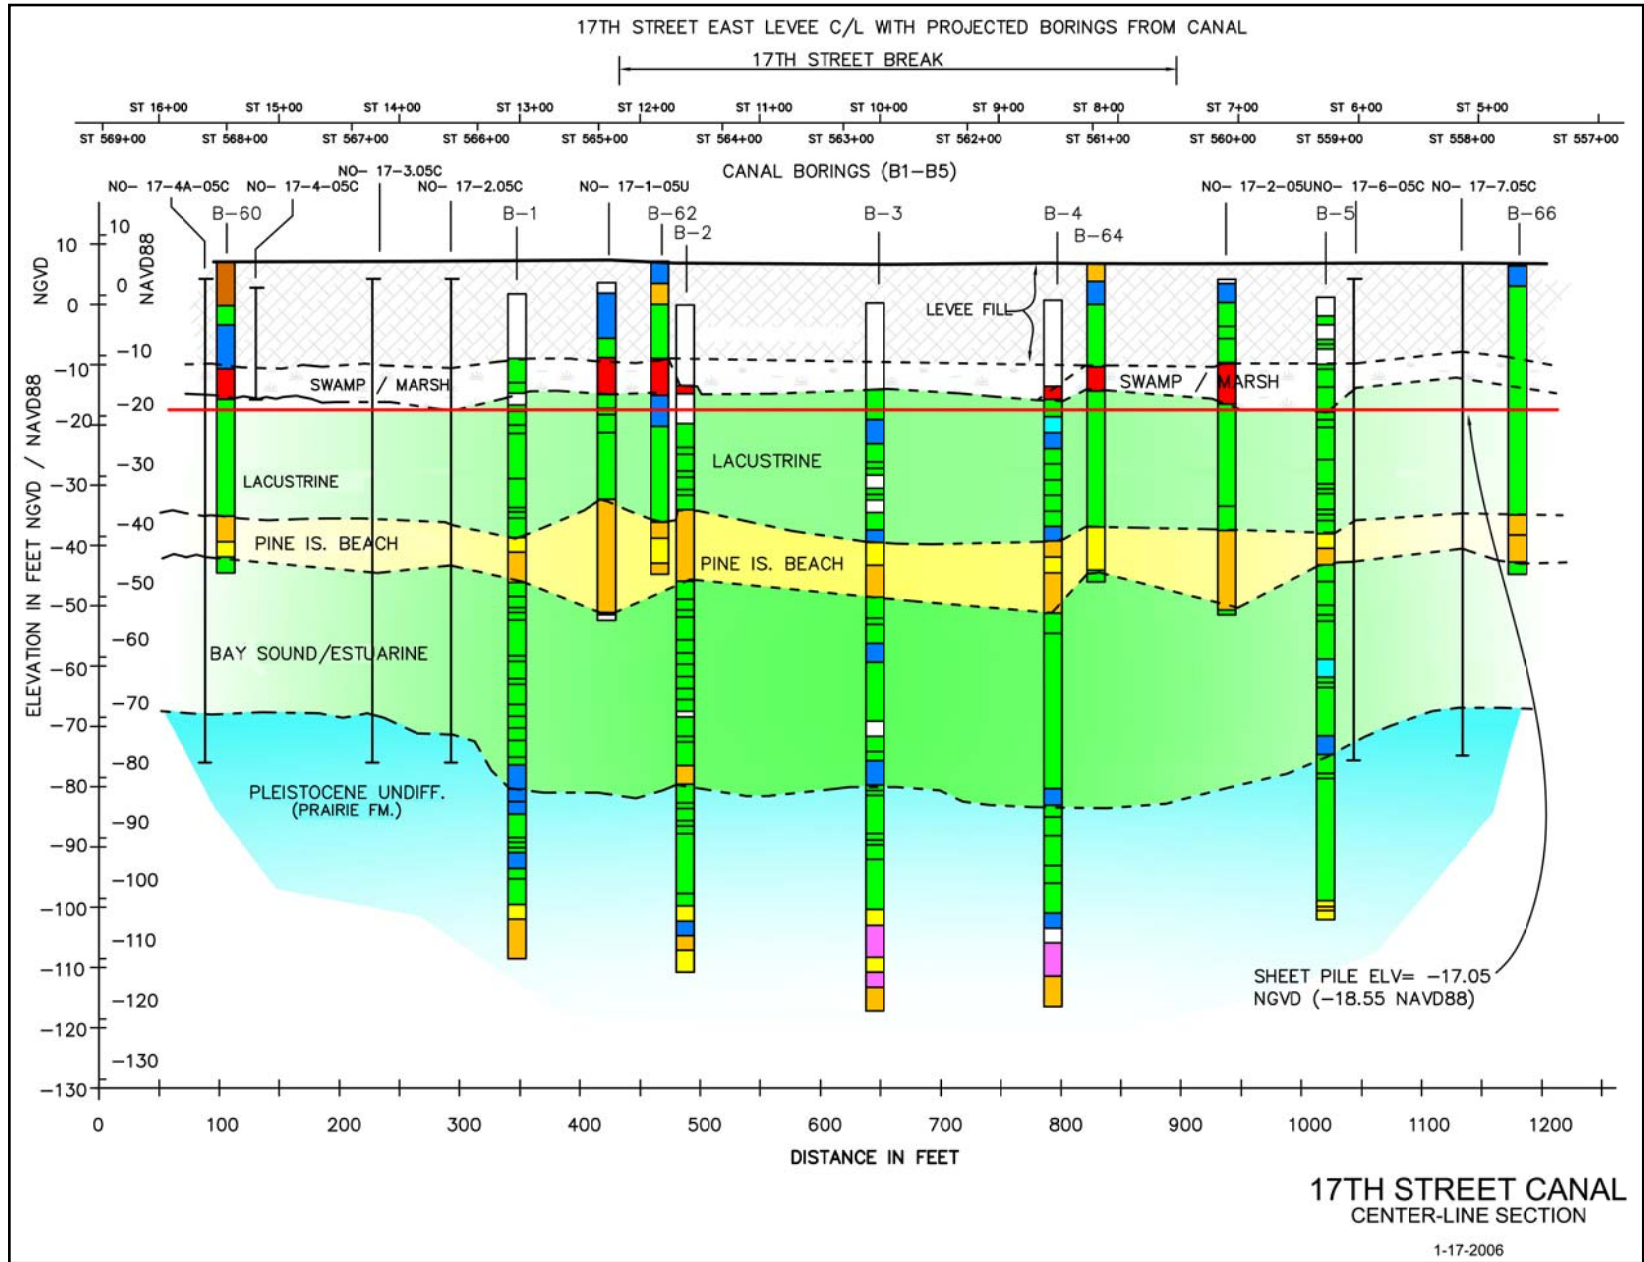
Centerline (CL) longitudinal section - 17th Street Canal breach.
